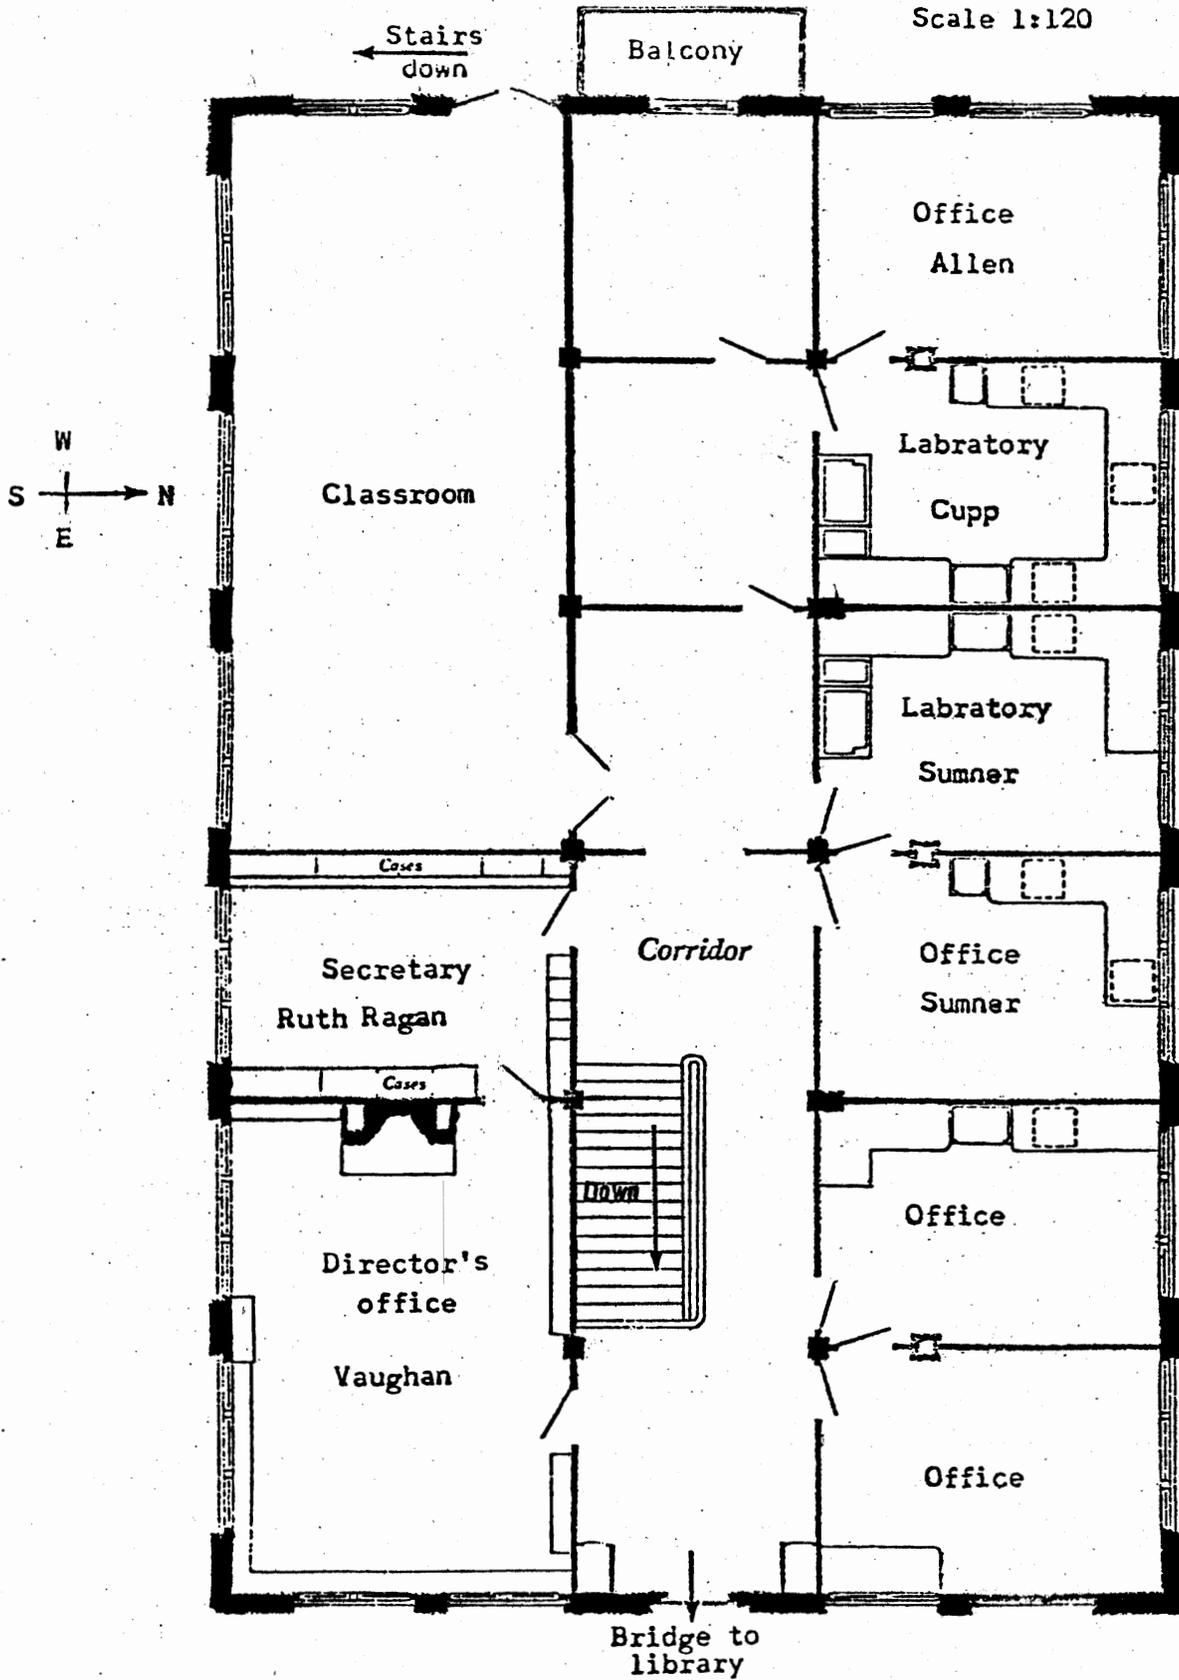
Second floor of Scripps Hall (50 x 75 ft) as of 1932. The double doors at the west end of the classroom and the stairs to the ground were installed in 1952 when the bridge to the library was demolished.
